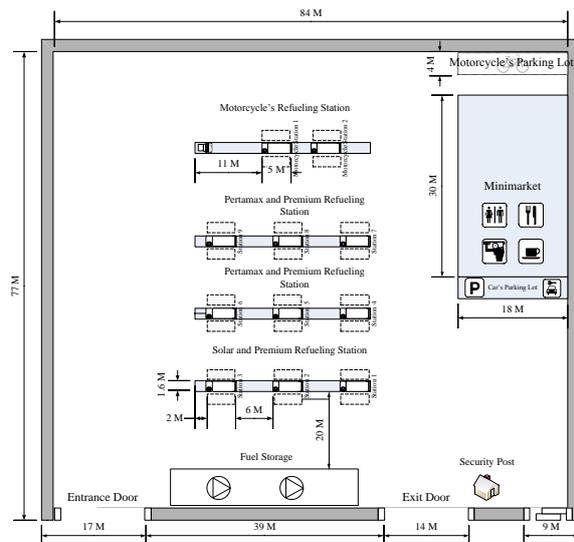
Layout of gas stations at Pertamina Alam Sutera
